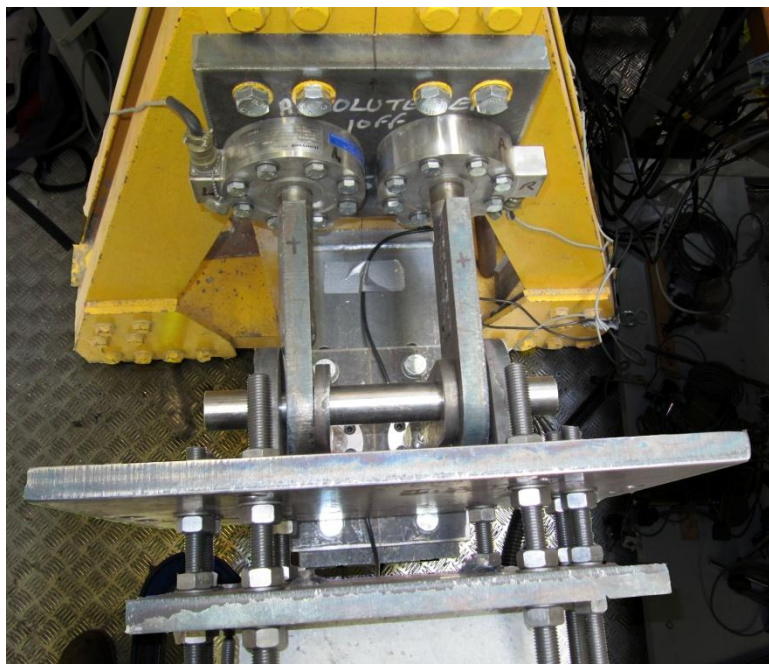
Plan view of end detail connection to specimen with load cell.
